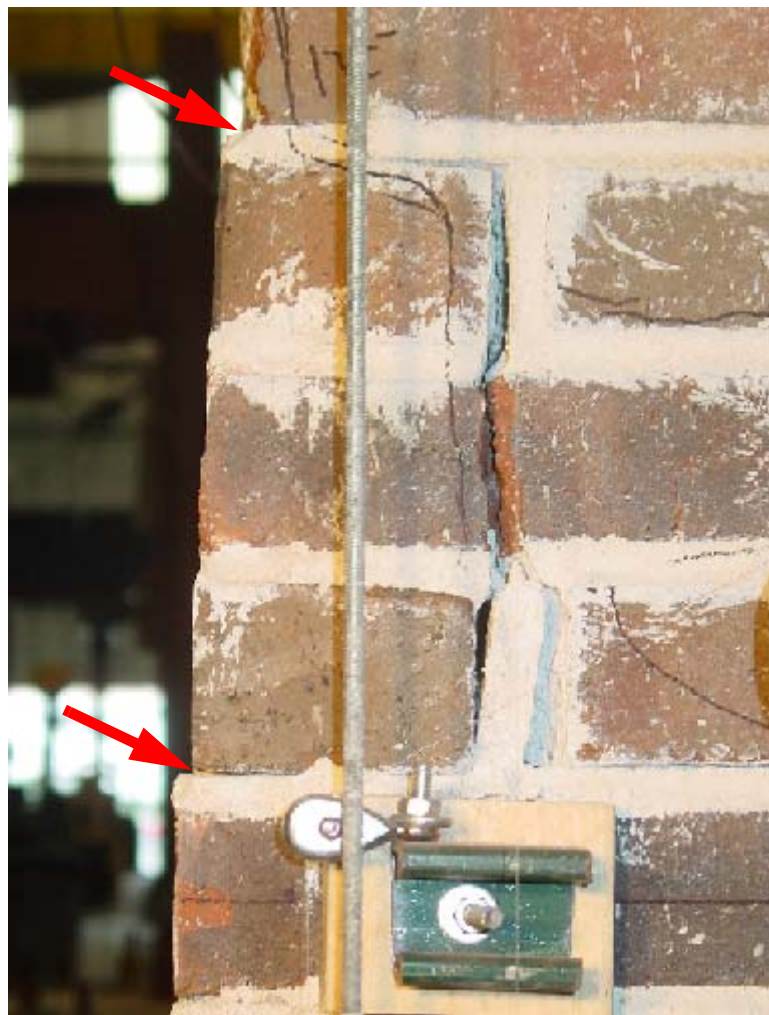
Photograph showing the offset at the corner of Wall 1 and Wall B due to the sliding deformation of pier P1-6 in the negative direction
